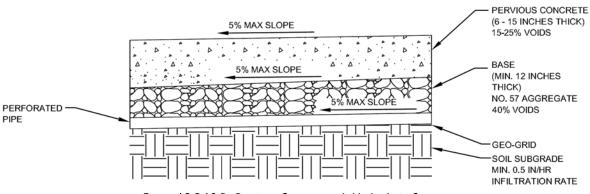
D. Pervious Concrete with Underdrain System
